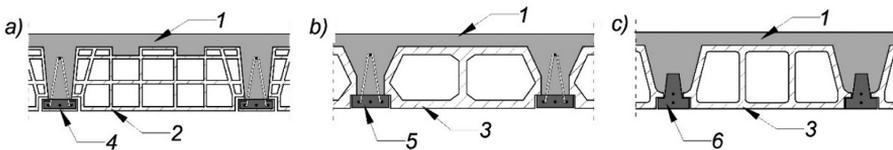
Examples of rib-and-block floors (1 – concrete overlay, 2 – ceramic ceiling block, 3 – lightweight concrete ceiling block, 4 – prefabricated ceramic-concrete beam with steel truss, 5 – prefabricated reinforced concrete beam with steel truss, 6 – prefabricated prestressed beam)
